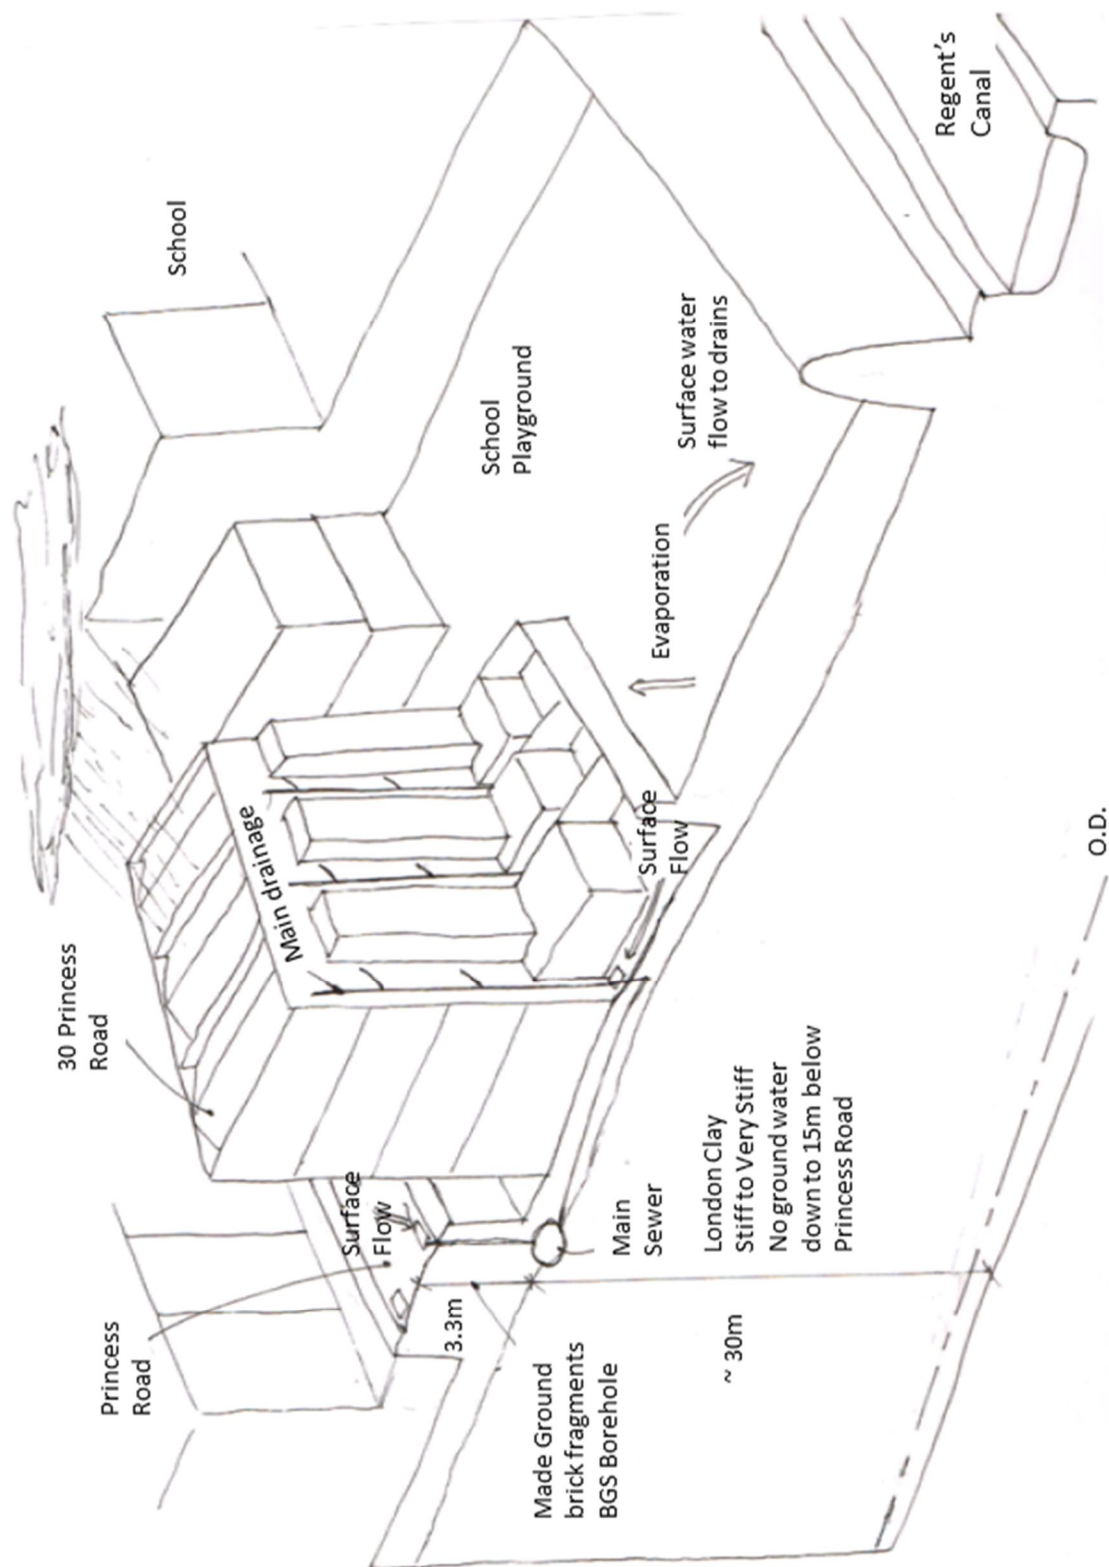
Existing Conceptual Site Model - 30 Princess Road
